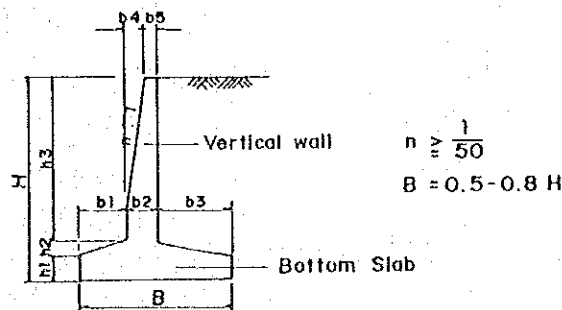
CANTILEVER TYPE CONCRETE WALL
